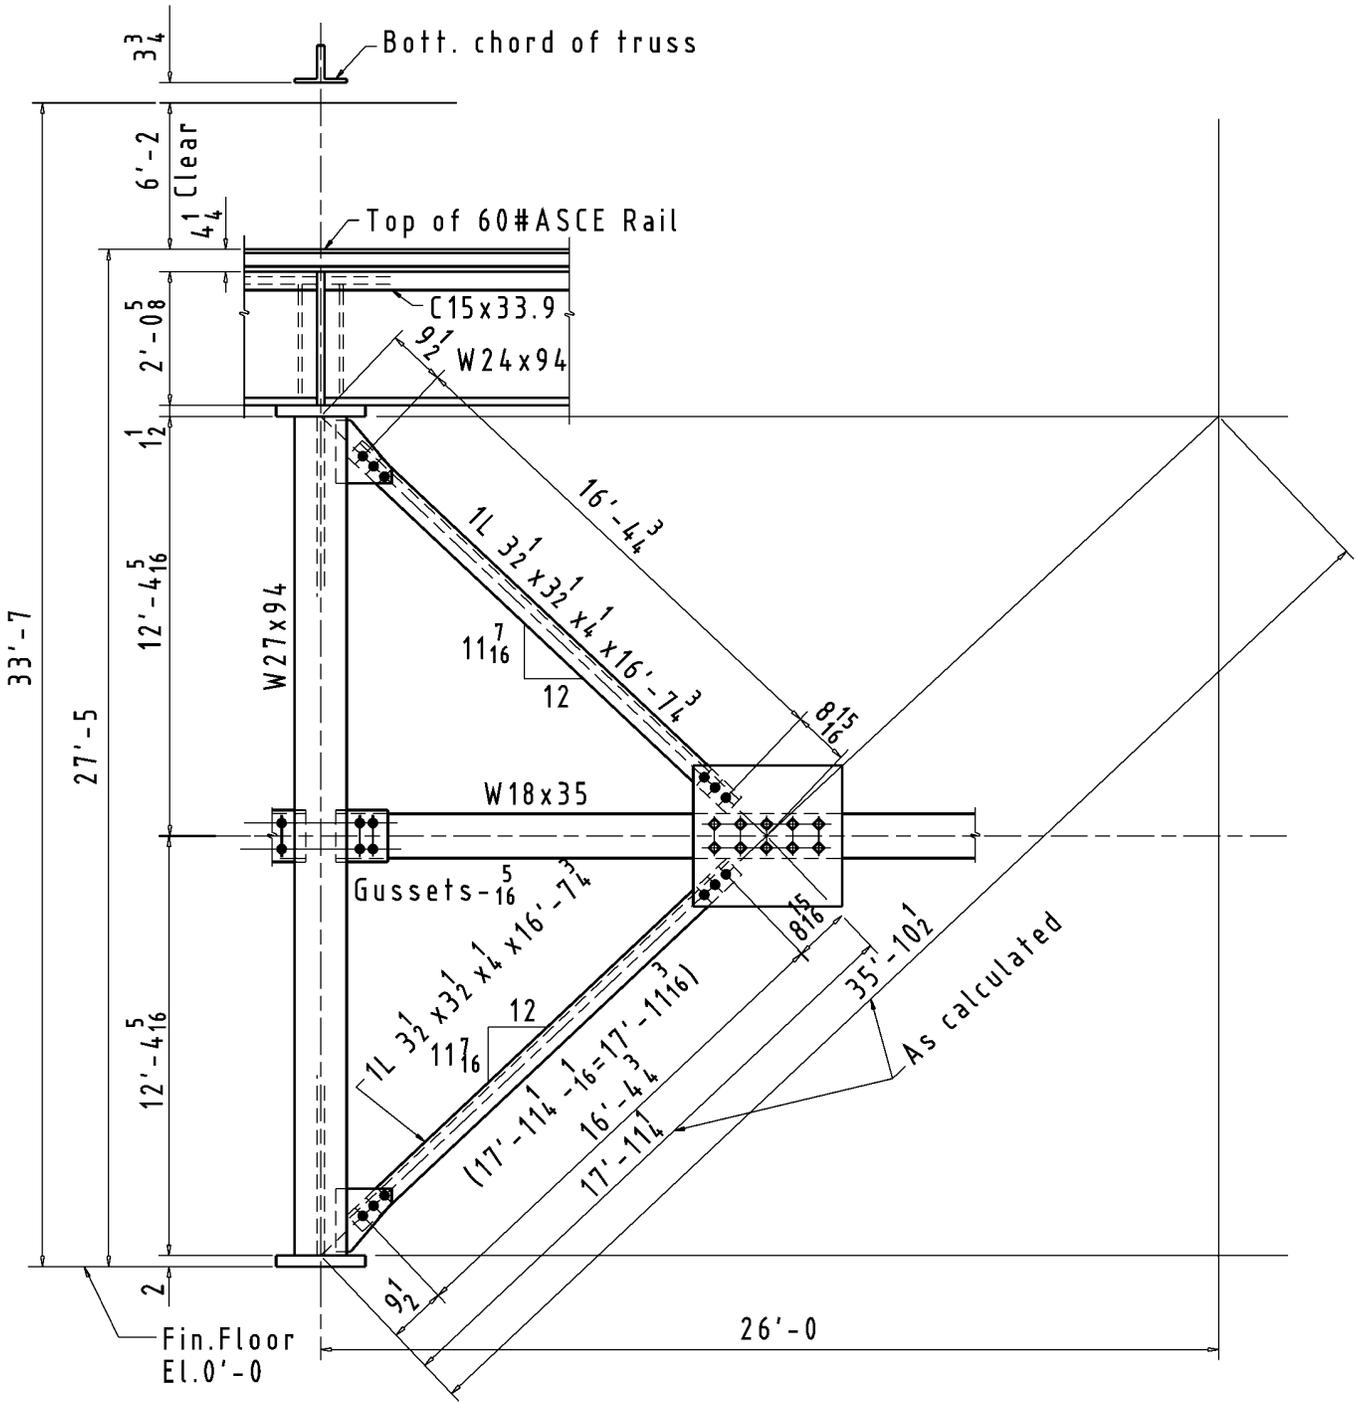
Dimensioned layout of a vertical bracing panel.
